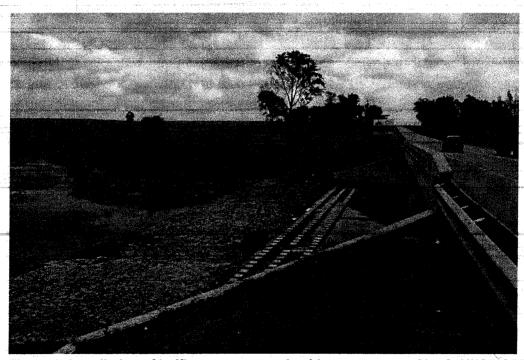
Installation of baffle structures and gabion mattress at Site C1UNSP-SPITS downstream of the bridge crossing to prevent downstream erosion and plunge pool formation
